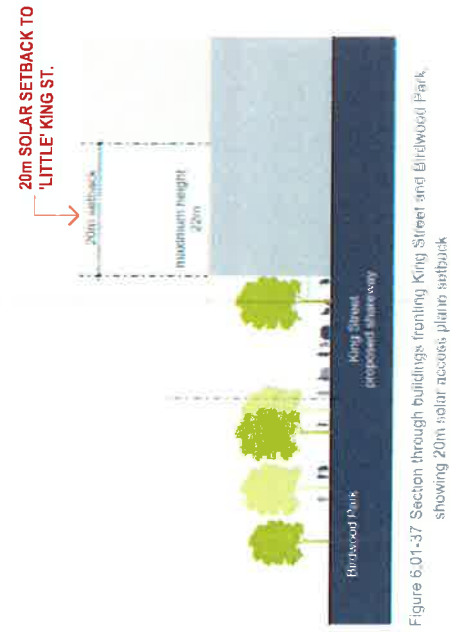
Section through buildings fronting King Street and Birdwood Park, showing 20m solar access plane setback
